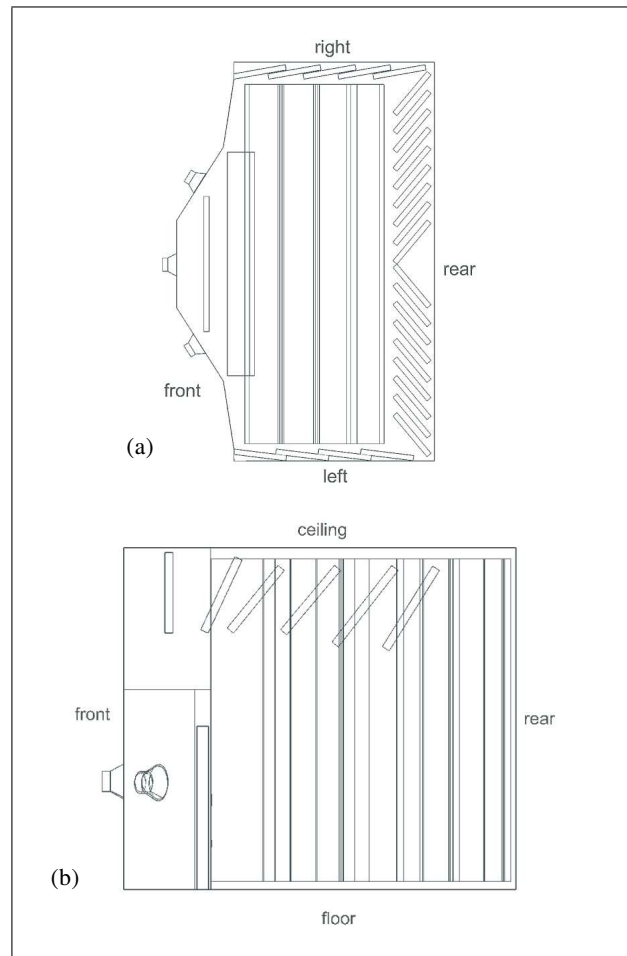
Panel placement inside the control room; (a) floor plan; (b) left elevation.
